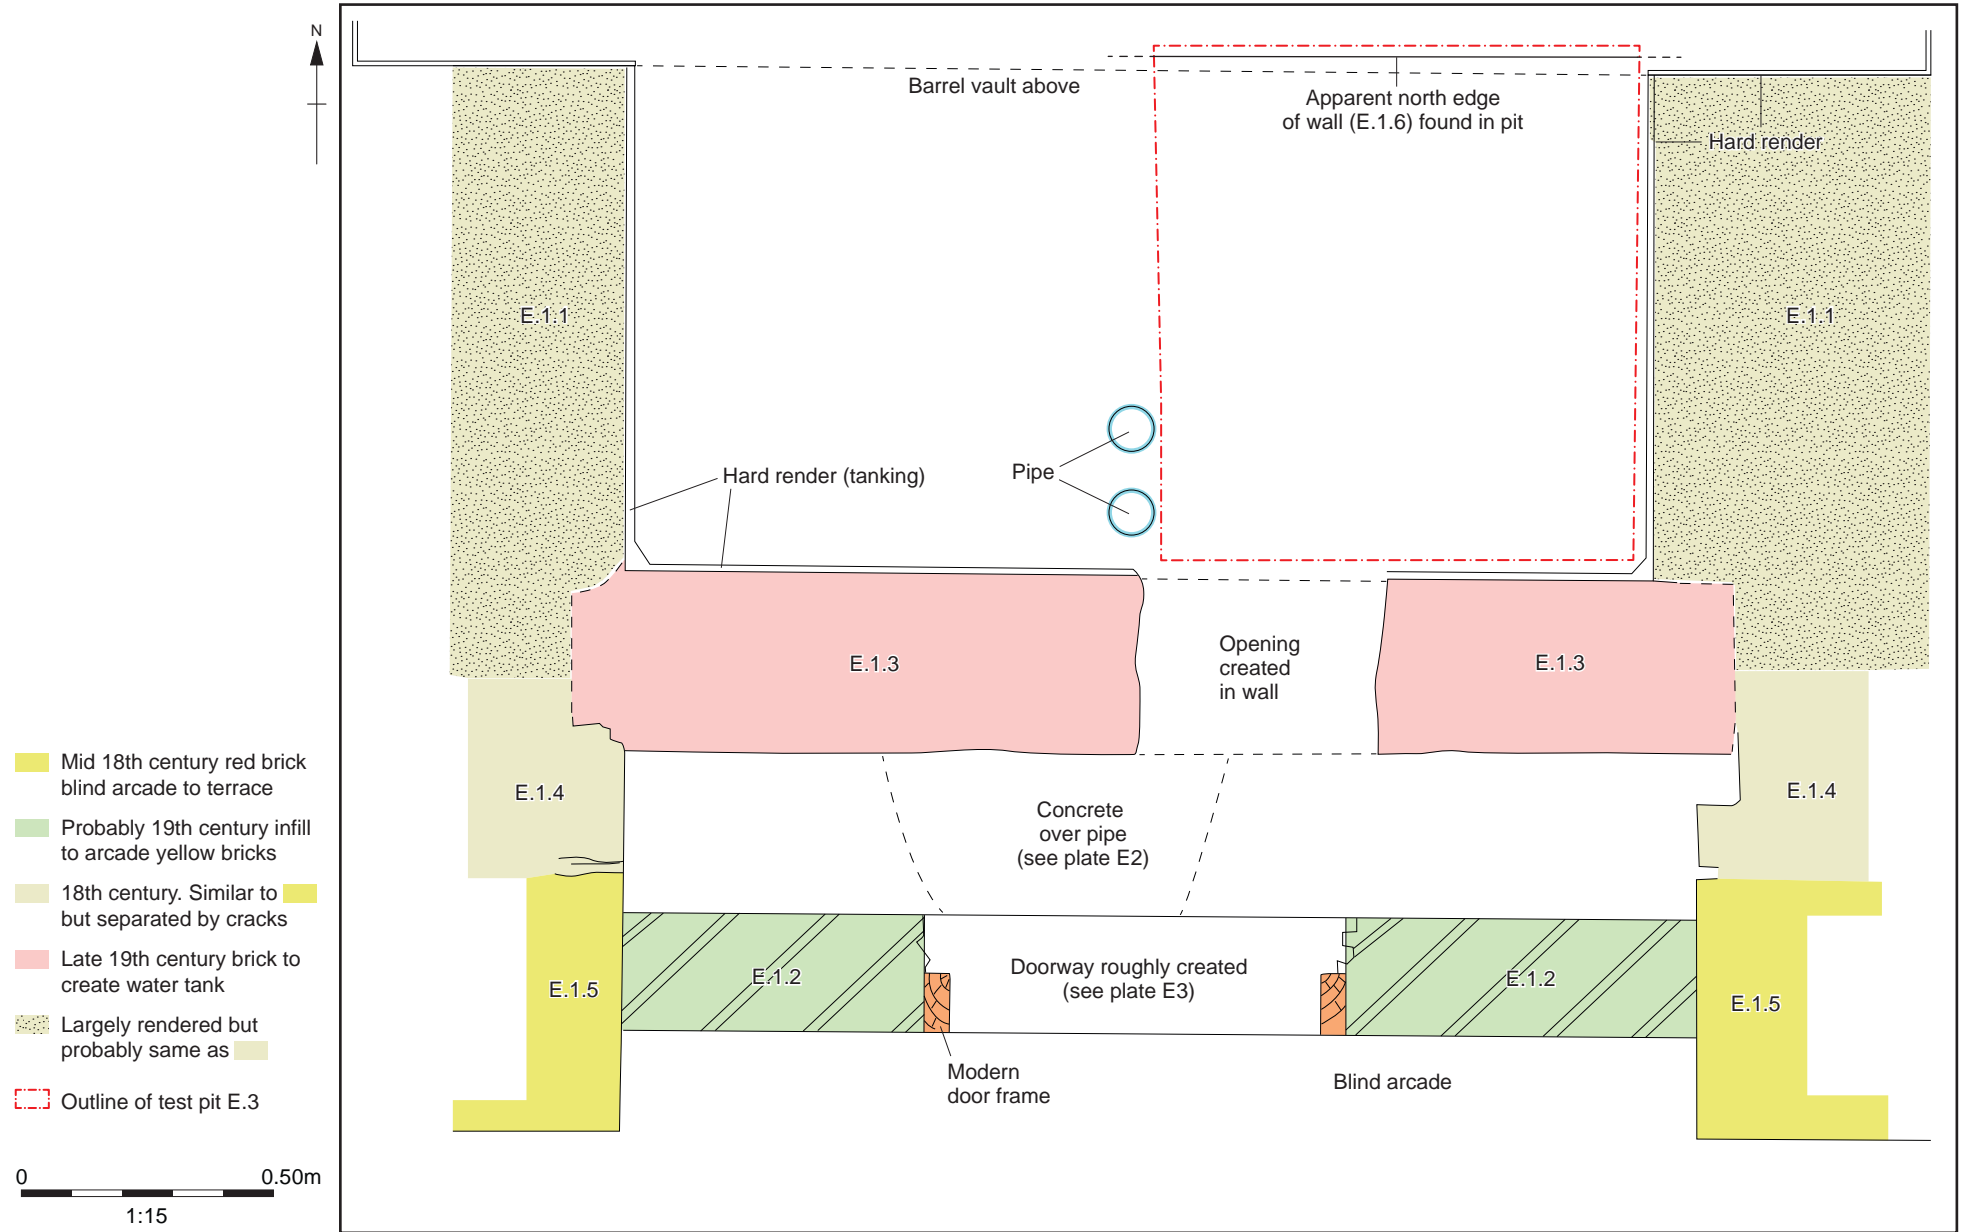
Plan through blind arcading and opening into West Barrel Vaulted Chamber
